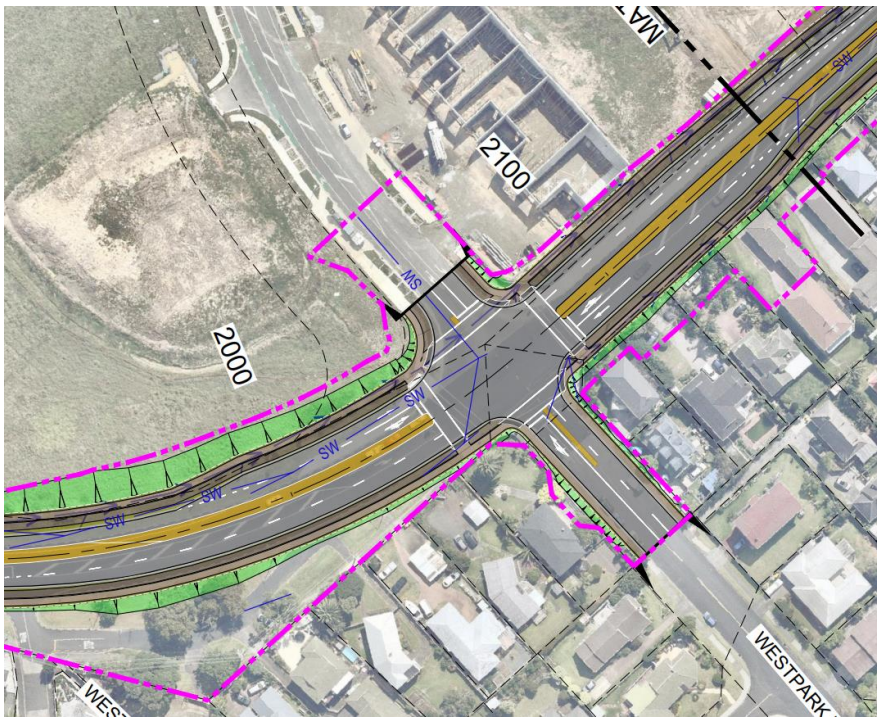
Extract from NOR General Arrangement Plan showing the Hobsonville Road widening at 84 Hobsonville Rd.
